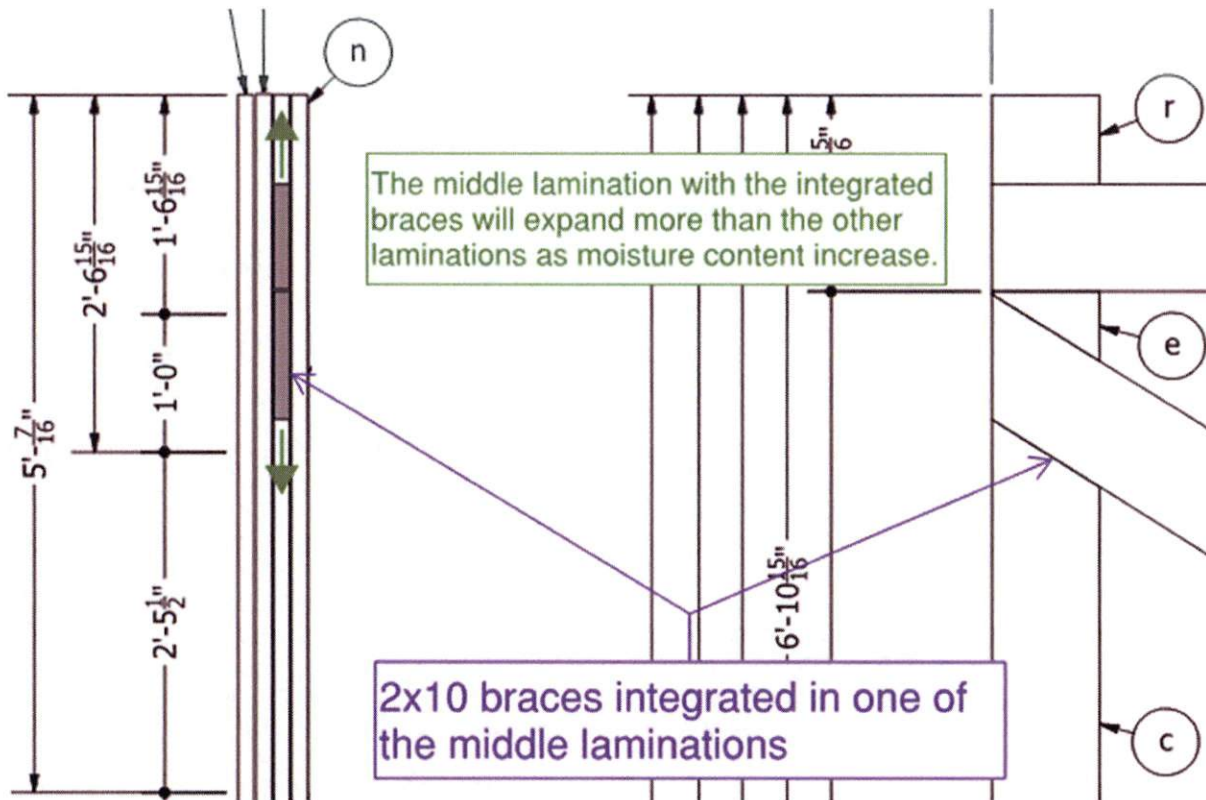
Shoring tower braces assembly detail, drawing "W-41b, Rev A - Shoring Tower C41"
